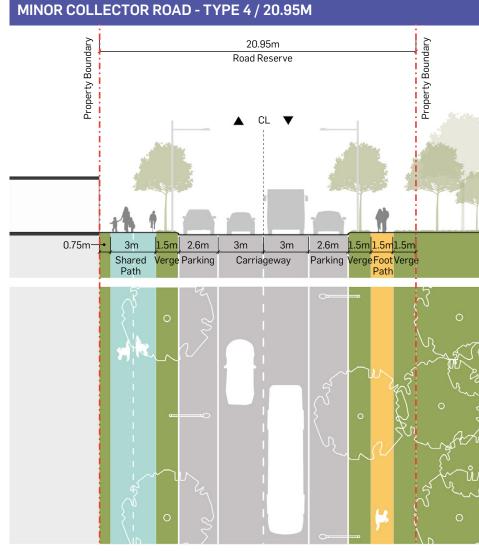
Indicative Street Section C-C' - Minor Collector Road - Type 4
